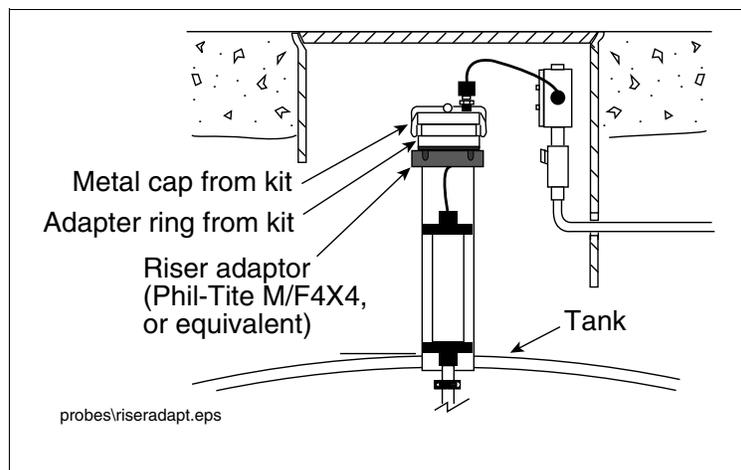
Installing a riser adaptor beneath the metal cap and adapter ring
